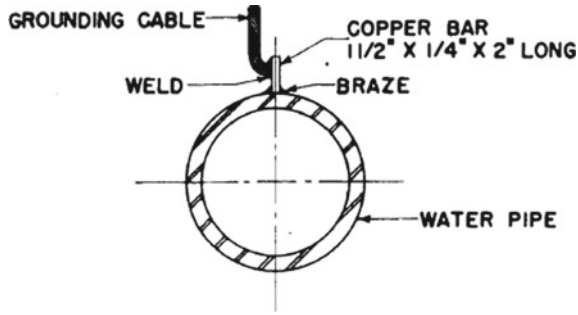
Water pipe bonding to ground connection. Adapted form Benjamin and Cundelan [1]
